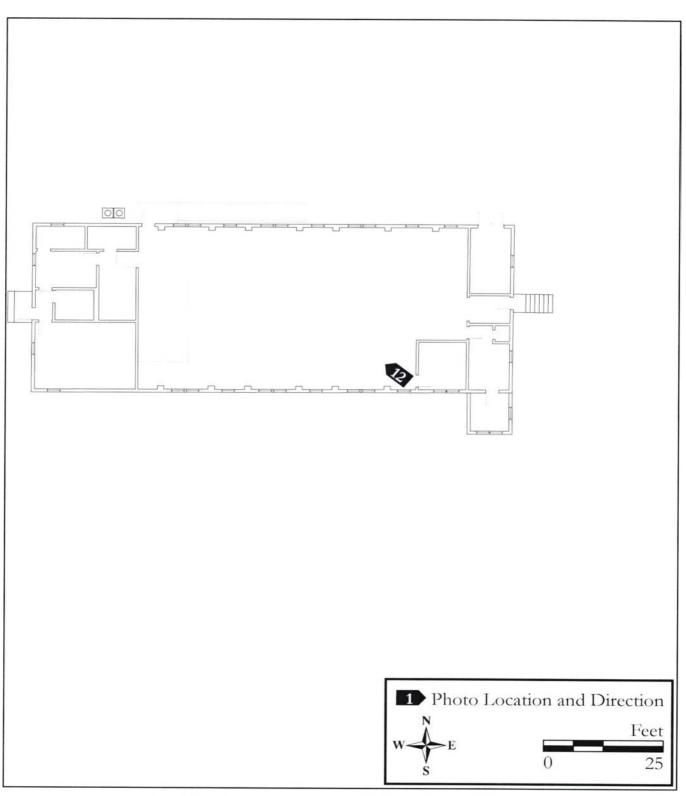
Interior photo location for Building 806 at Camp Kilmer.
